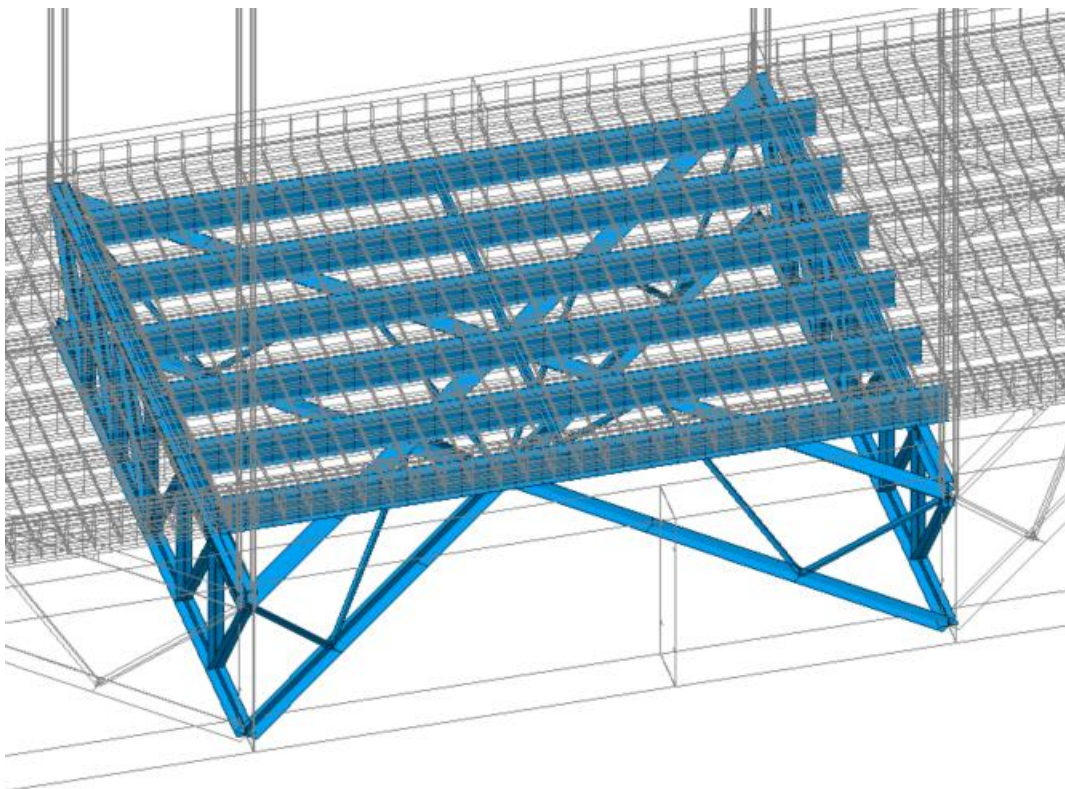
Trussed lateral bracing of the bridge - FE model.
